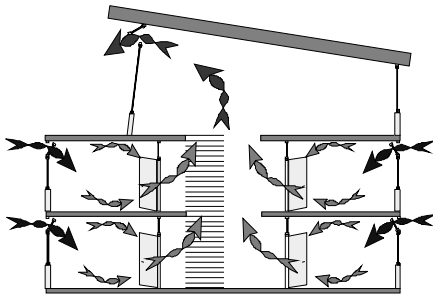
Night ventilation concept for ground and first floor of offices with opening flap at the roof.
